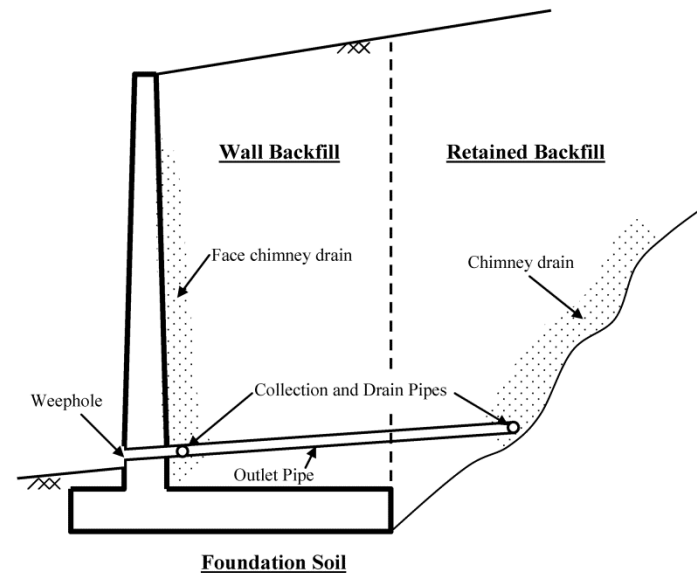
Drains behind backfill in cantilever wall in a cut situation.
